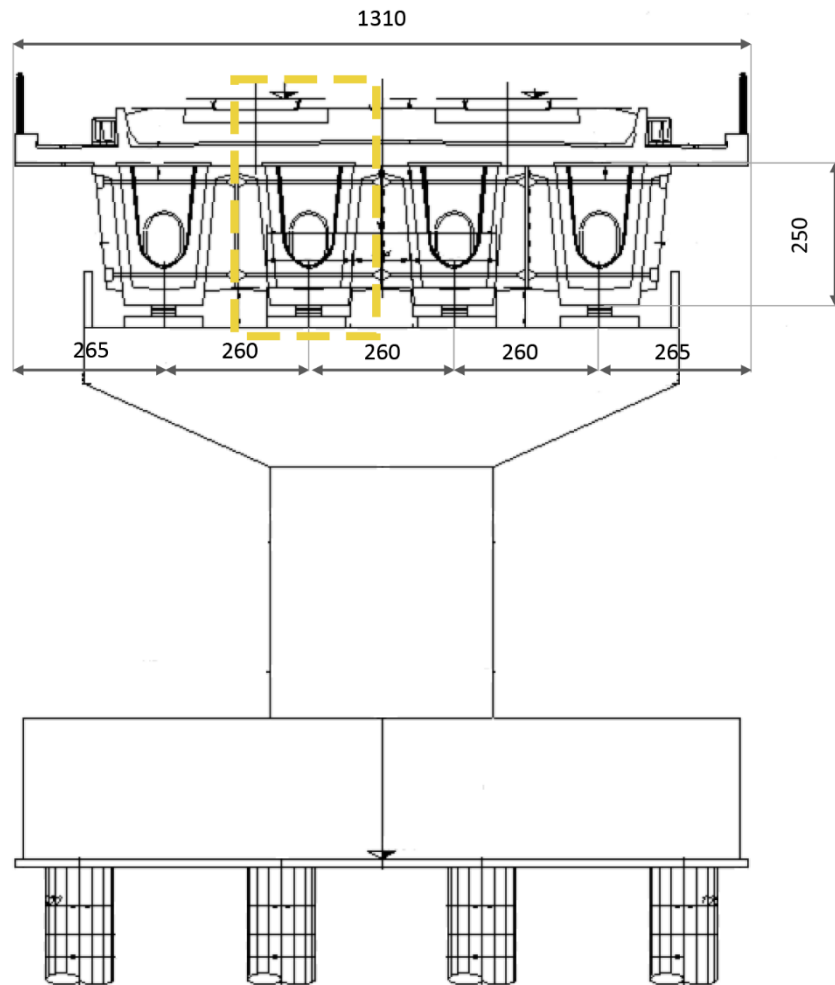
Pile elevation and bridge cross-section with indication of considered beam (dimensions in centimeters).
